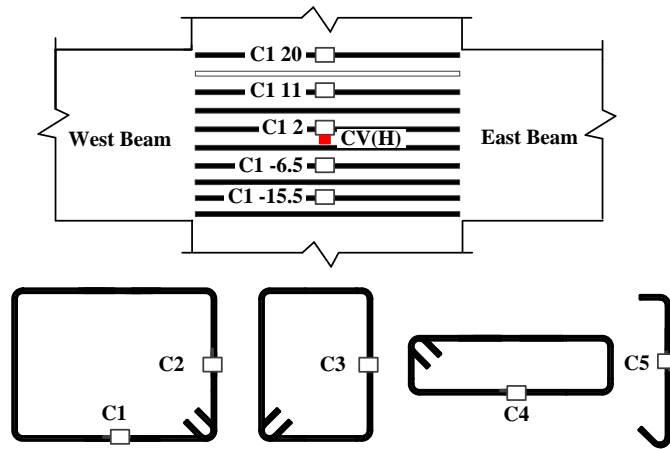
Steel and concrete strain in joint of RC-SP-NL
